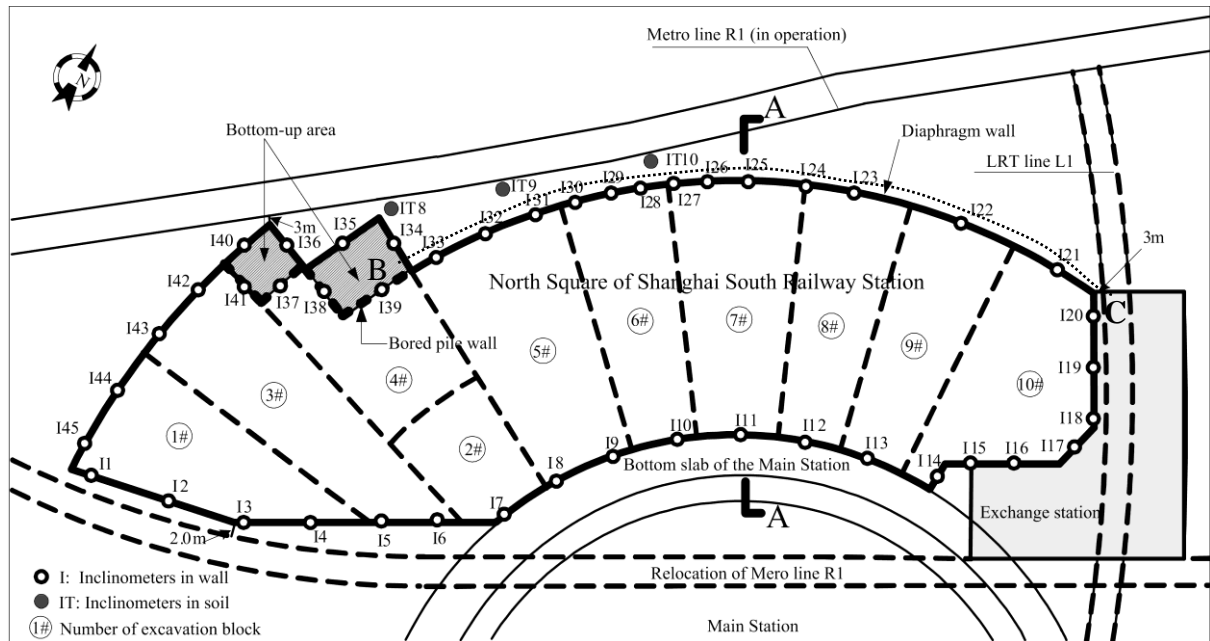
The excavation, adjacent facilities and instrumentation (Xu 2007)
